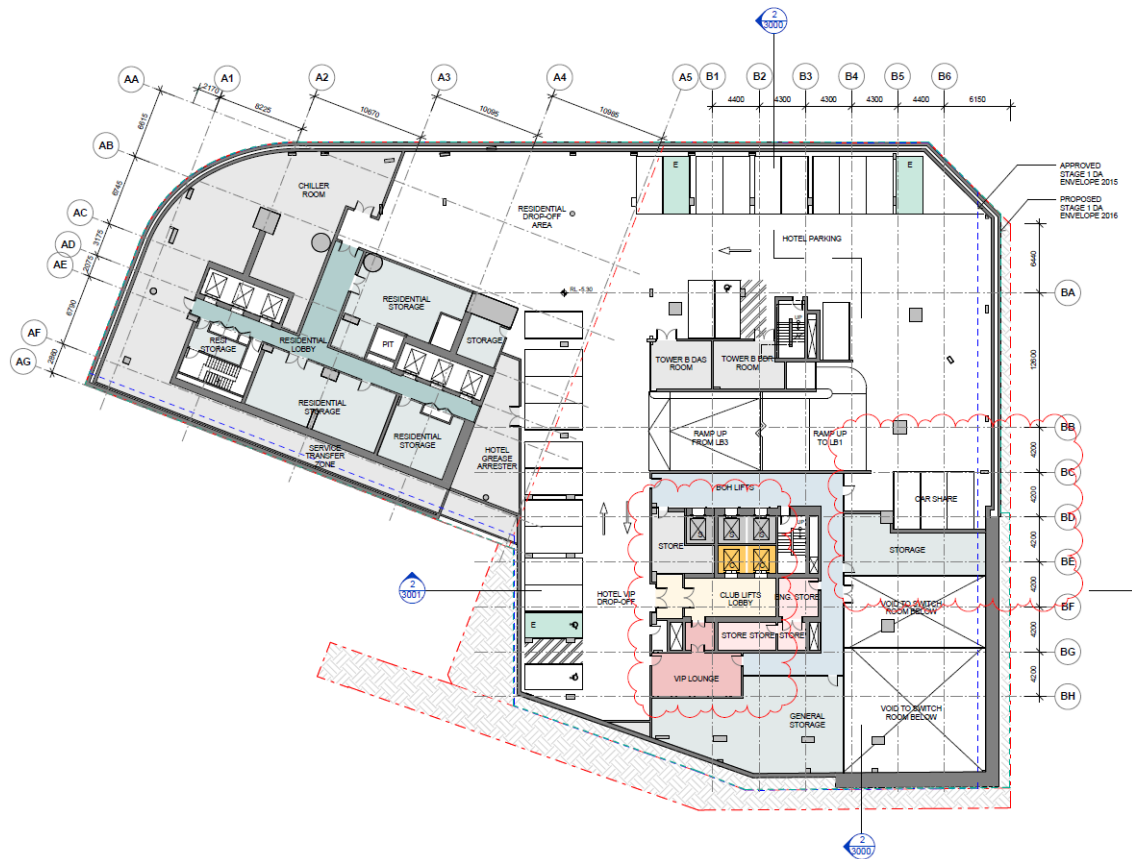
Basement 2 hotel parking, back of house, residential drop off and residential storage
